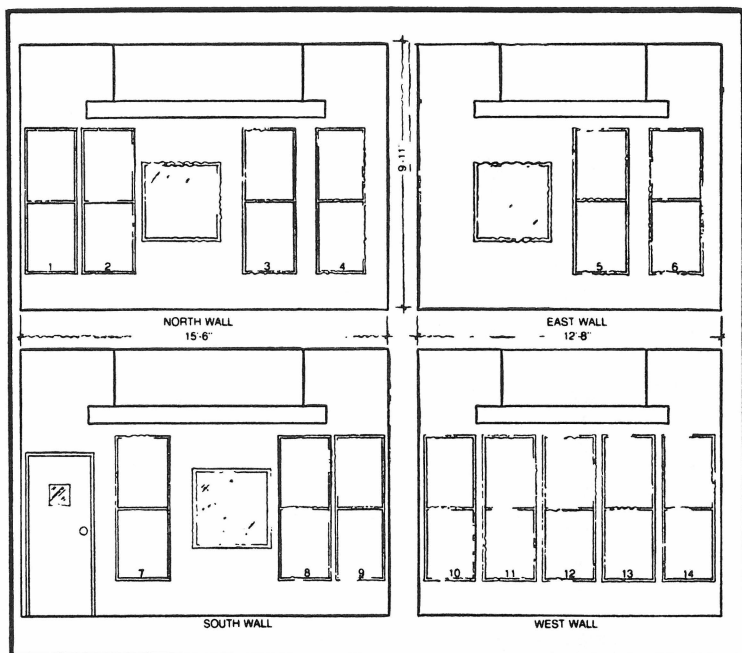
Wall elevations of master control showing original location of wideband wall modules before adjustments were made.
